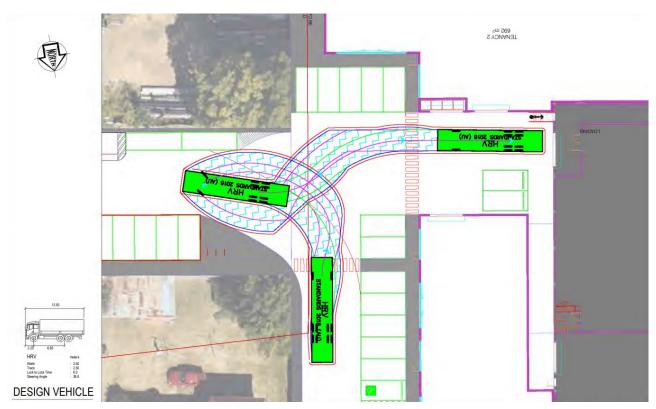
Albert Street Crossover - HRV Loading Zone 2 - Ingress Movement
